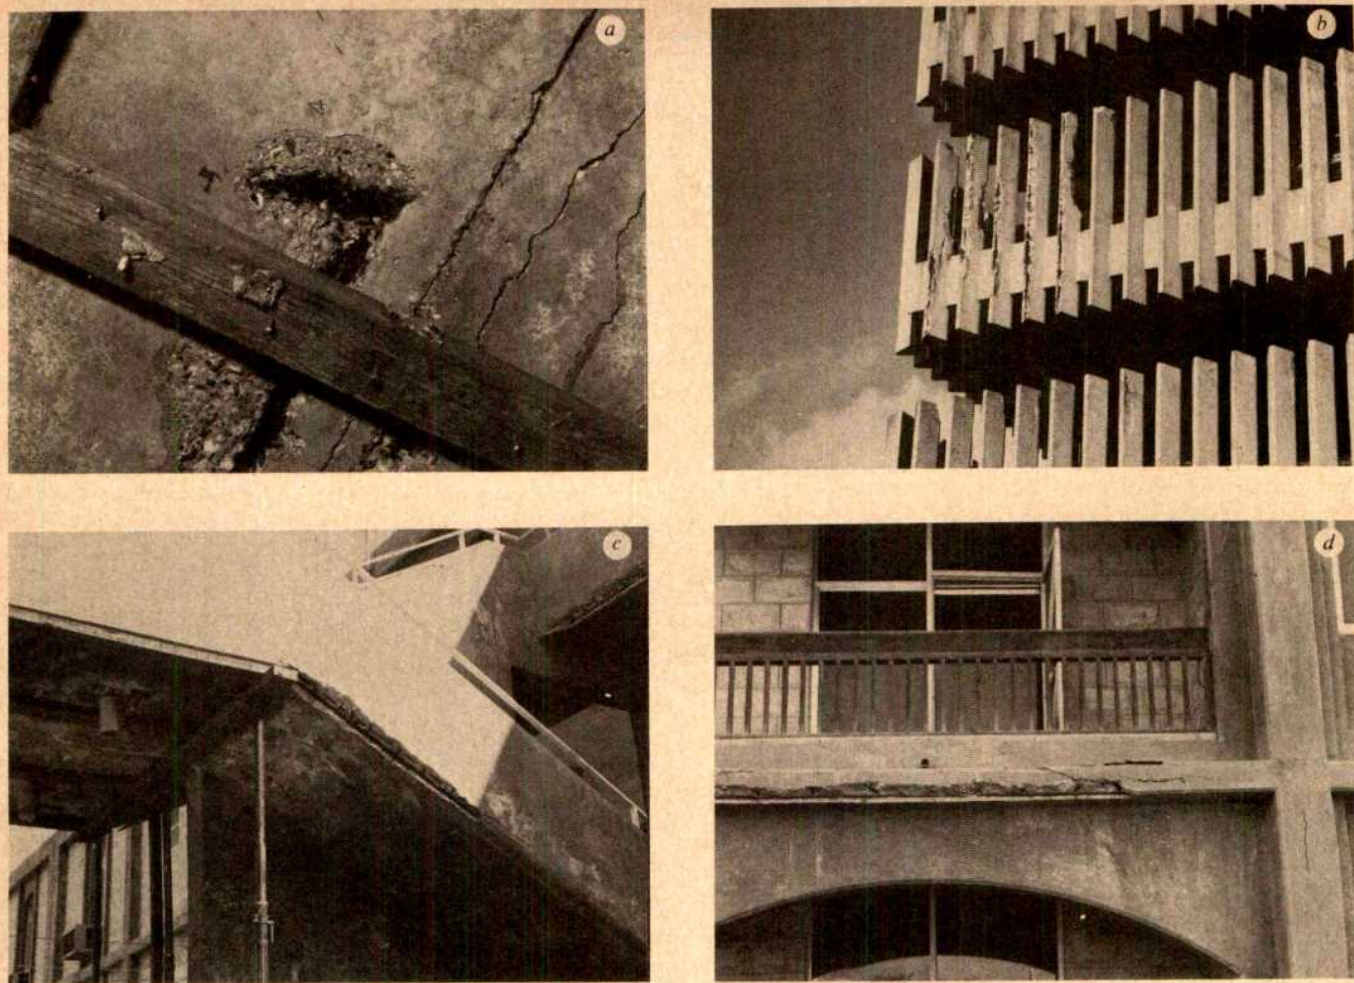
a*, Cracking and spalling in the soffit of precast concrete roof planks resulting from reinforcement corrosion and leading to a loss of serviceability requiring roof replacement. *b*, Corrosion revealed when cracked concrete cover was removed from a number of precast concrete fins in a multi-storey car park. *c*, Propping of a staircase necessitated by structural weakening as a result of reinforcement corrosion (in a Middle Eastern structure). *d*, Spalling of cover to reinforcement in beams, and cracking of columns, as a result of reinforcement corrosion in a Middle Eastern building.
